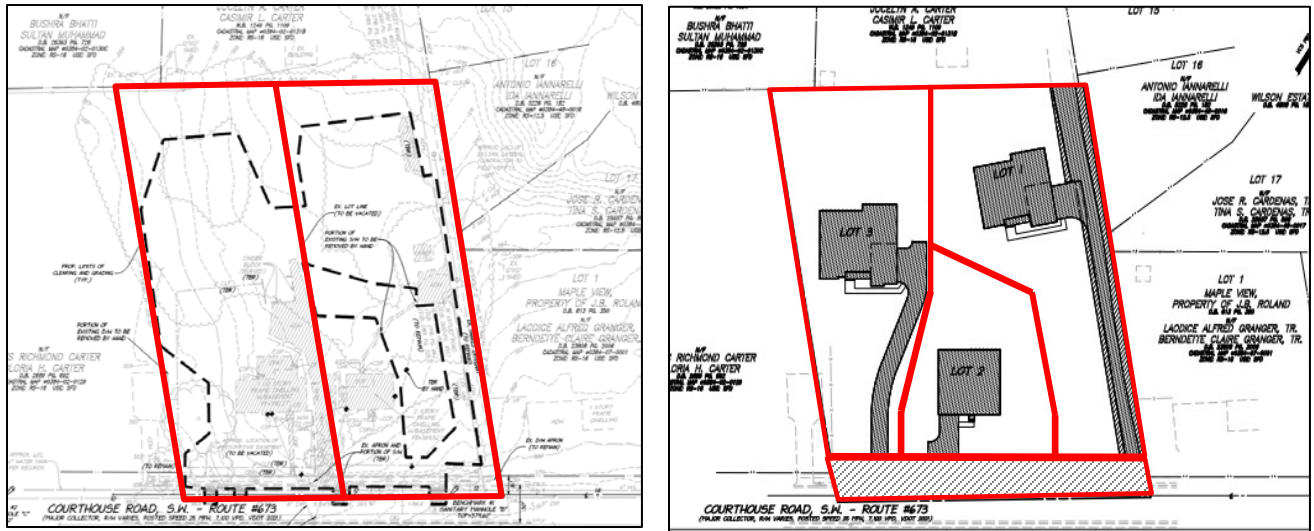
Existing and proposed lot configurations excerpt from submitted plans
